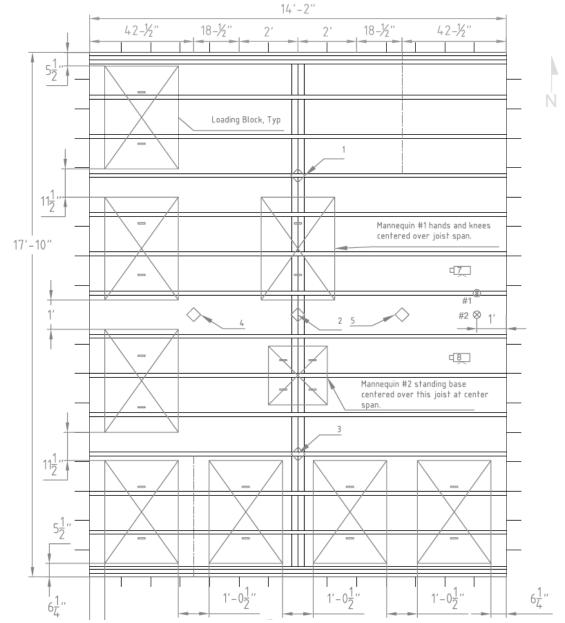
Loading and Instrumentation Layout (See Figure A.3.8).
